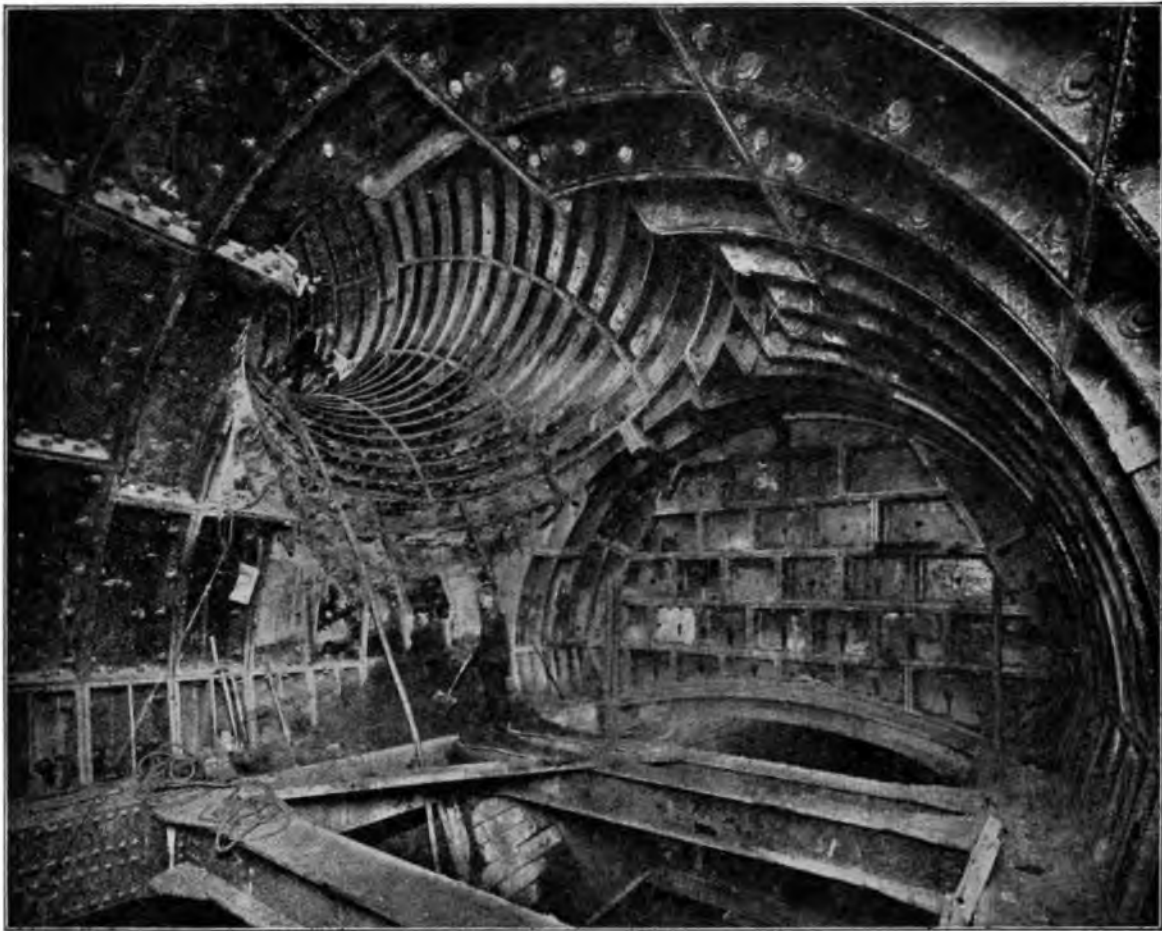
NORTH JOHN STREET EXHAUST DUCT, DURING CONSTRUCTION.
